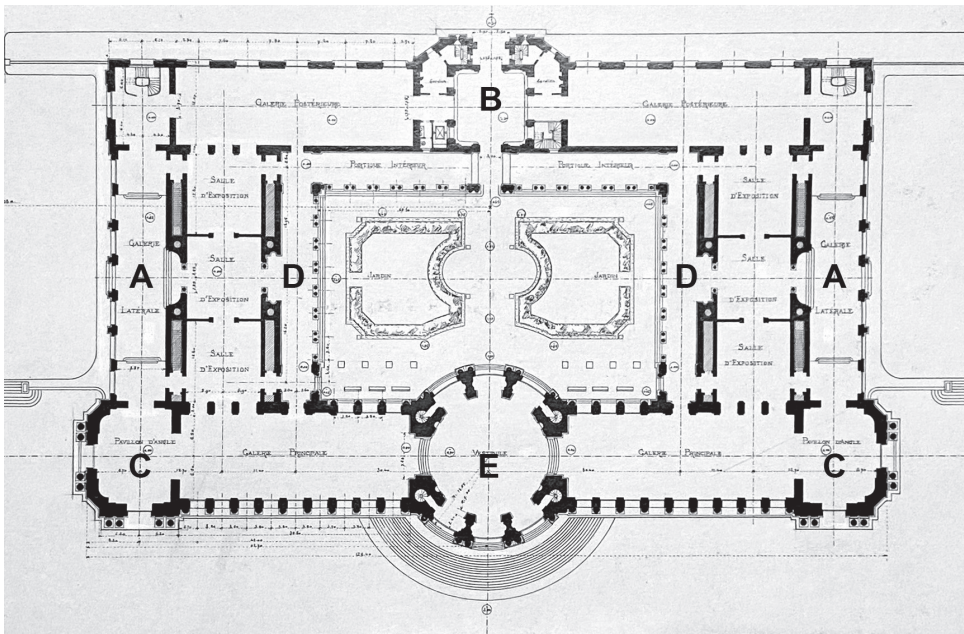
Plan of the Congo Museum (detail of drawing no. 654, HA.01.0827.18, RMCA Tervuren collection, Charles Girault archives).
